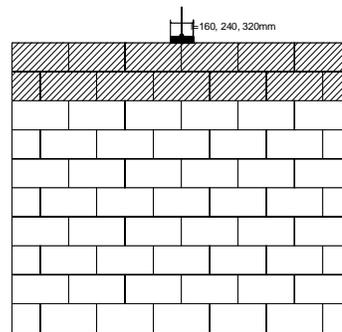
Two-course bond-beamed hollow concrete masonry wall
